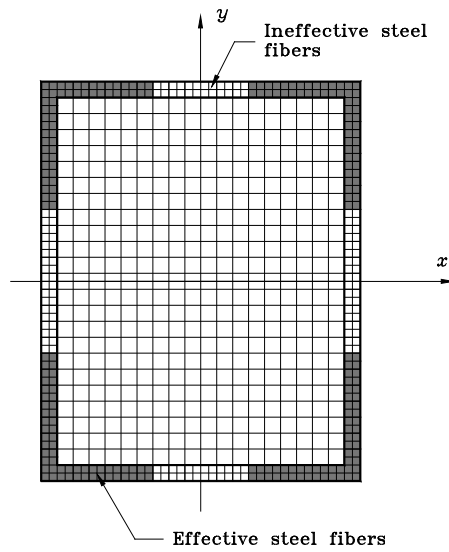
Effective width of steel plates in concrete-filled steel box column
